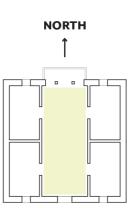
Schematic floorplan of a Lebanese Liwan house with three centered arches towards north.
